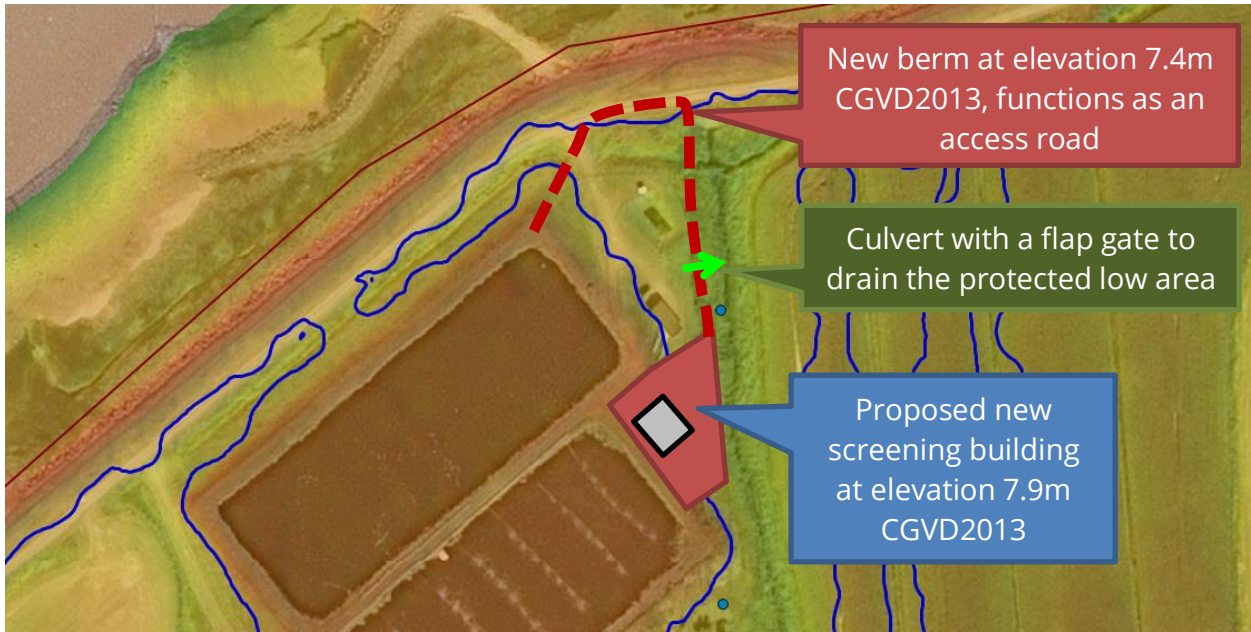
Proposed Berm to Protect WWTF Buildings
